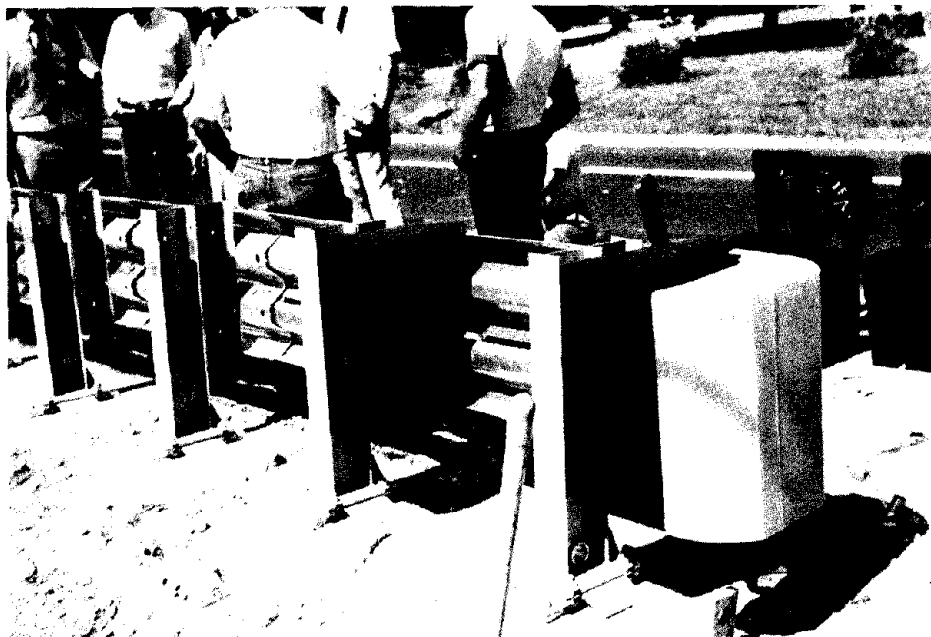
SENTRE under construction. Anchor and redirecting cables are not yet in place.
